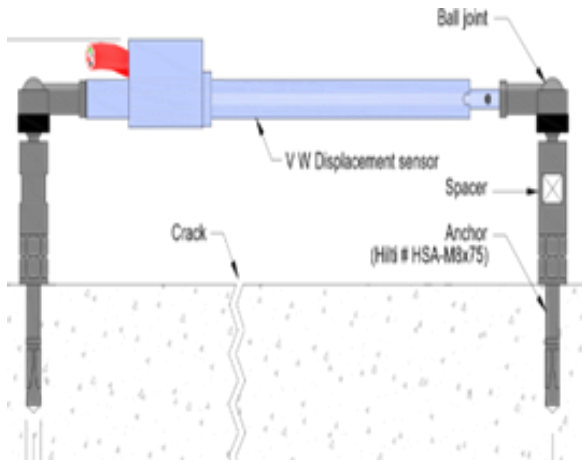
Vibrating Wire Type Crack Meter (Uniaxial)
